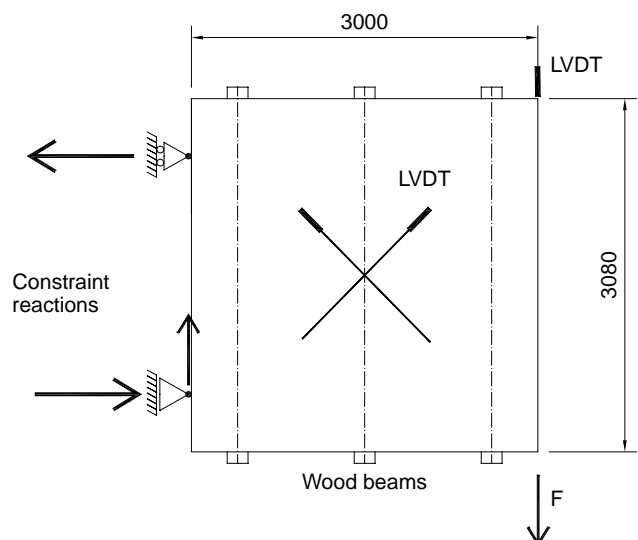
Test static scheme with indication of position of wood beams and LVDTs (dimensions in mm).
